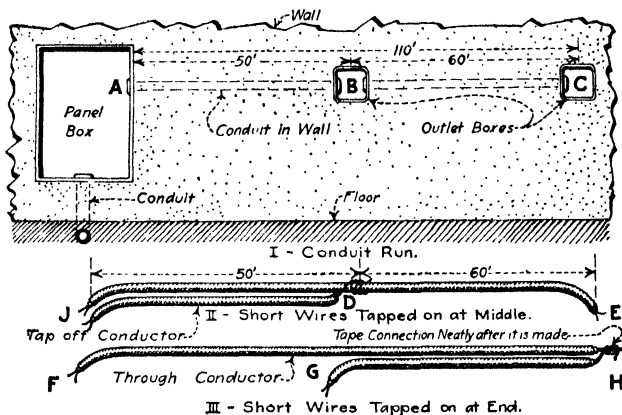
Showing methods of tapping on a short wire for drawing in.
